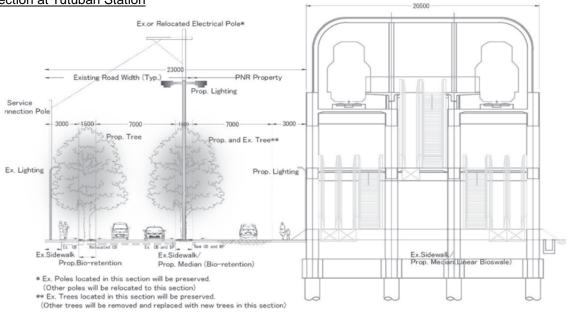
Typical Section of Dagupan Street Widening with NSCR
